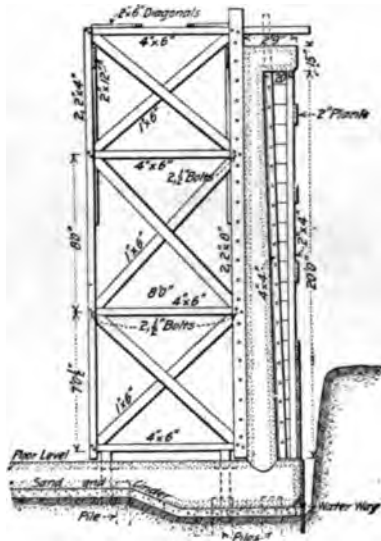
Method of Bracing Wall Forms, Dubuque Gas Holder Tank.
